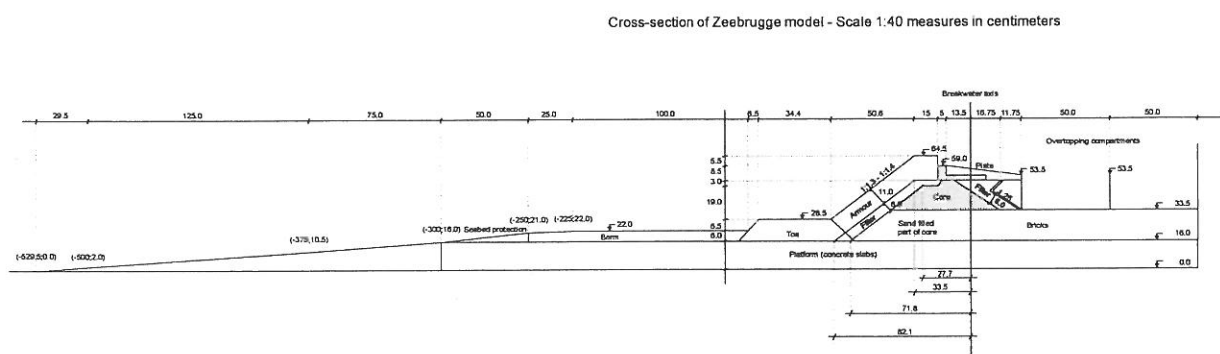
Cross section of the Zeebrugge breakwater model in scale 1:40.
